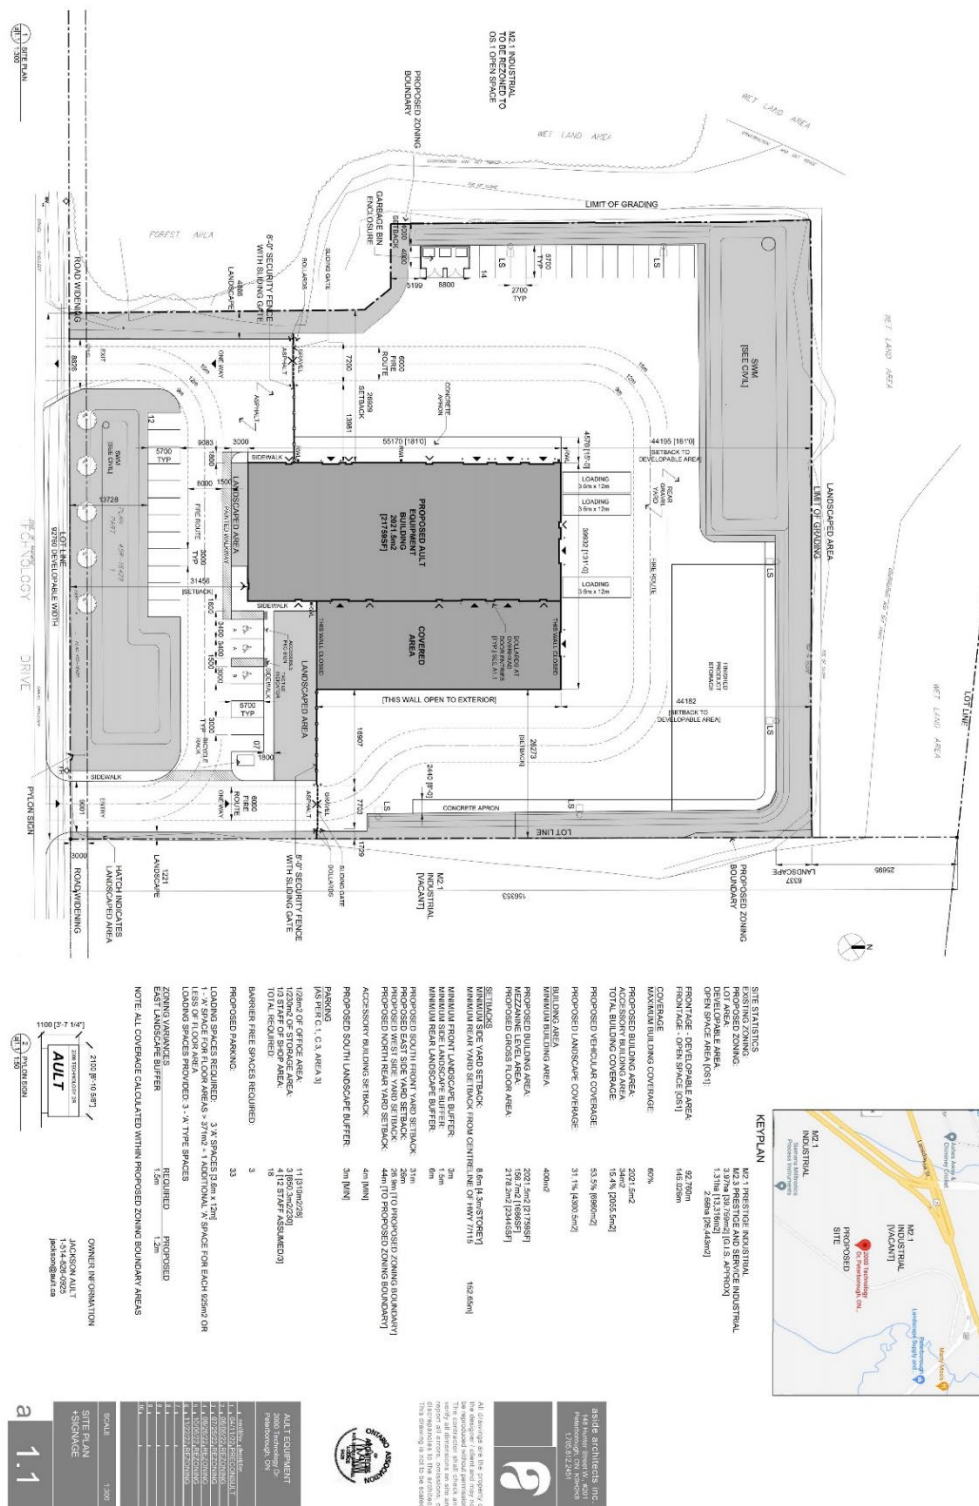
Exhibit B – Concept Plan – Whole Site (Page 2 of 2)
